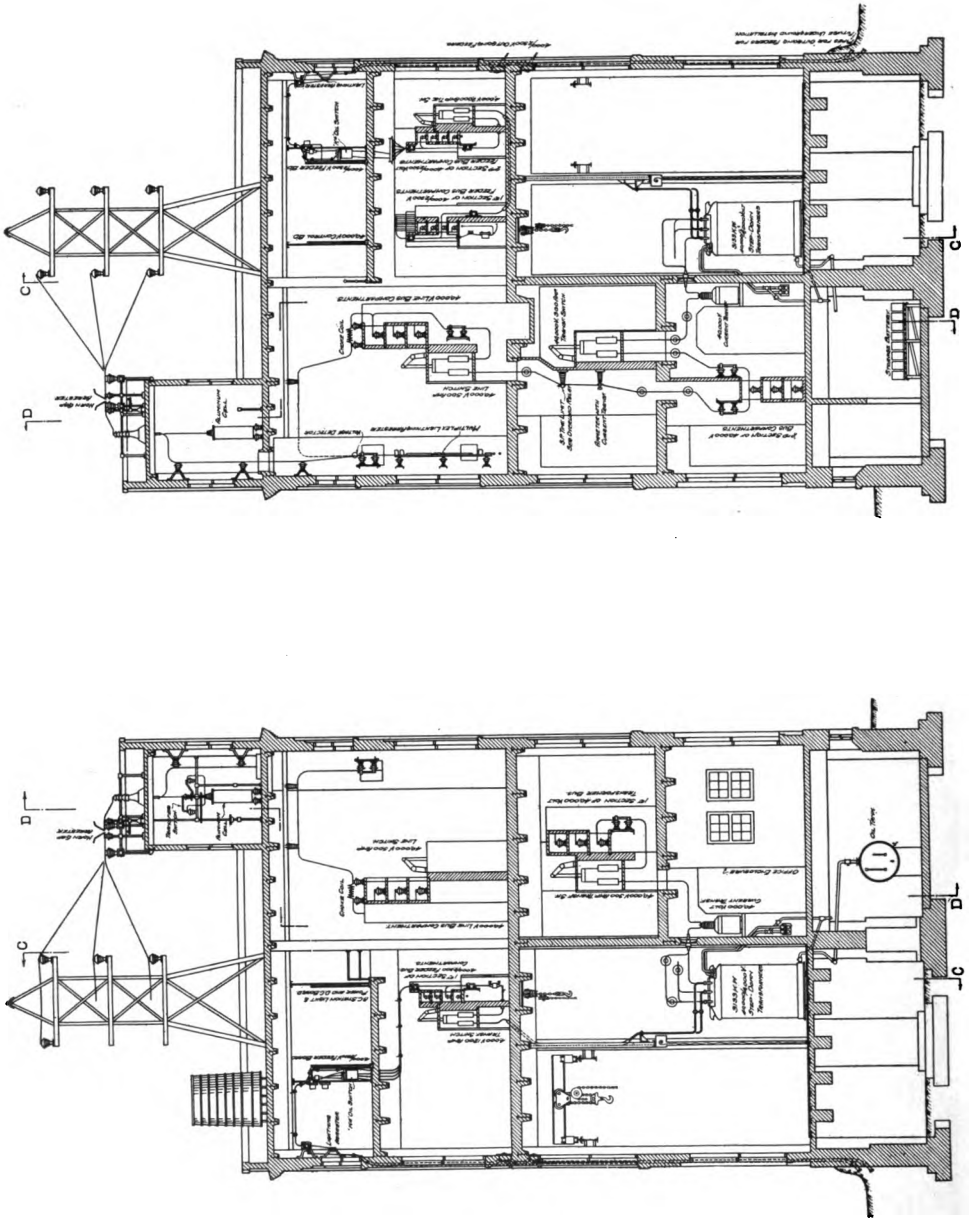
Cross Sections A-A and B-B, Substation, Chattanooga & Tennessee River Power Co.
